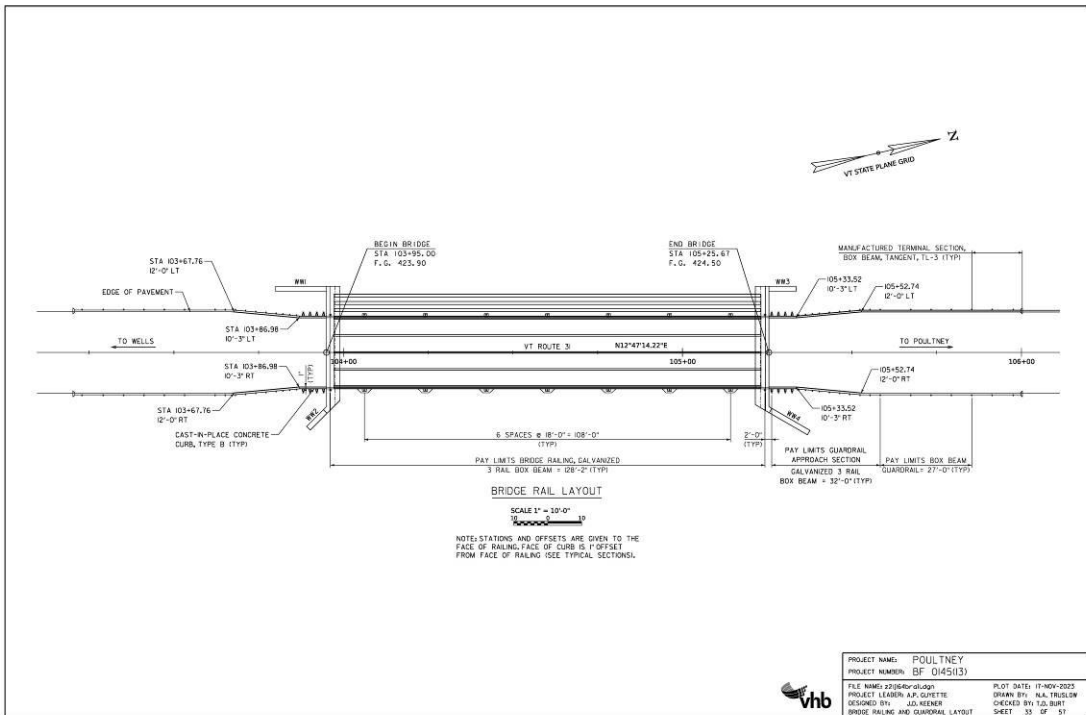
Bridge Railing and Guardrail Layout, Sheet 33 of 57. Preliminary Plans, November 2023.
